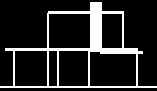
In and outdoor space [De Grote Beer, n.d.]
